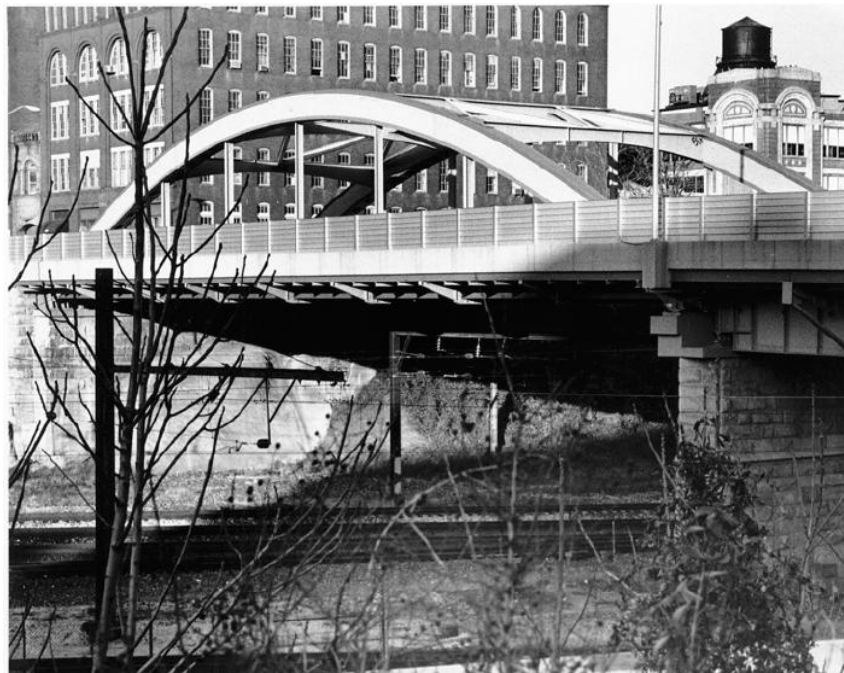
Typical metal arch bridge on Guilford Avenue in Baltimore
